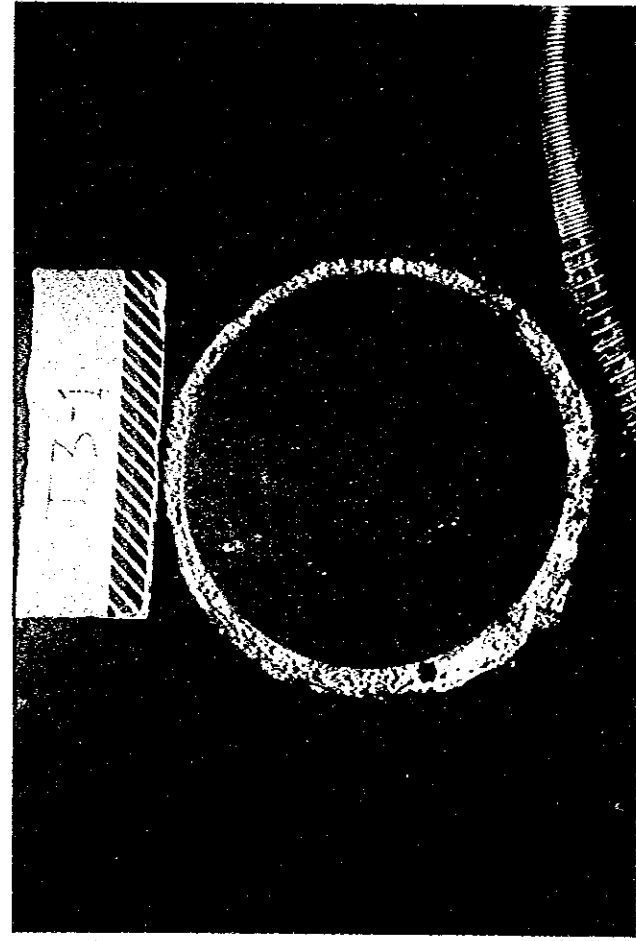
Tested Rock Surface Photograph for In-Situ Plate Loading
